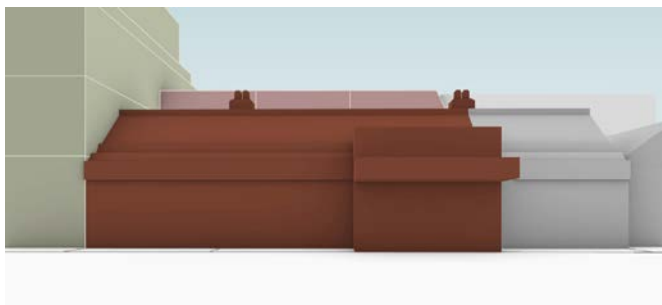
VIEW 1 - Looking north at the subject sites from the southern footpath on Swan Street.
